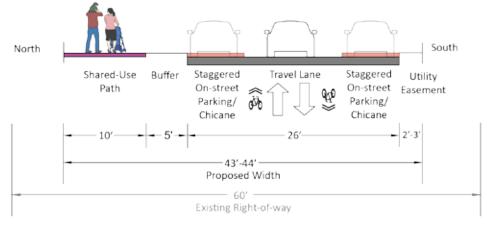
Proposed cross-section for Monroe Street, between 72nd Avenue and 78th Avenue (west of the Monroe Gap)
